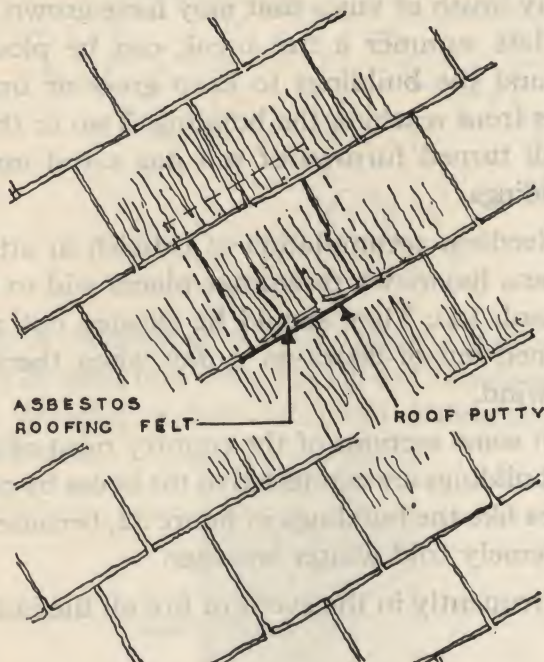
How to repair defective wood roofs with asphalt or asbestos felt.
